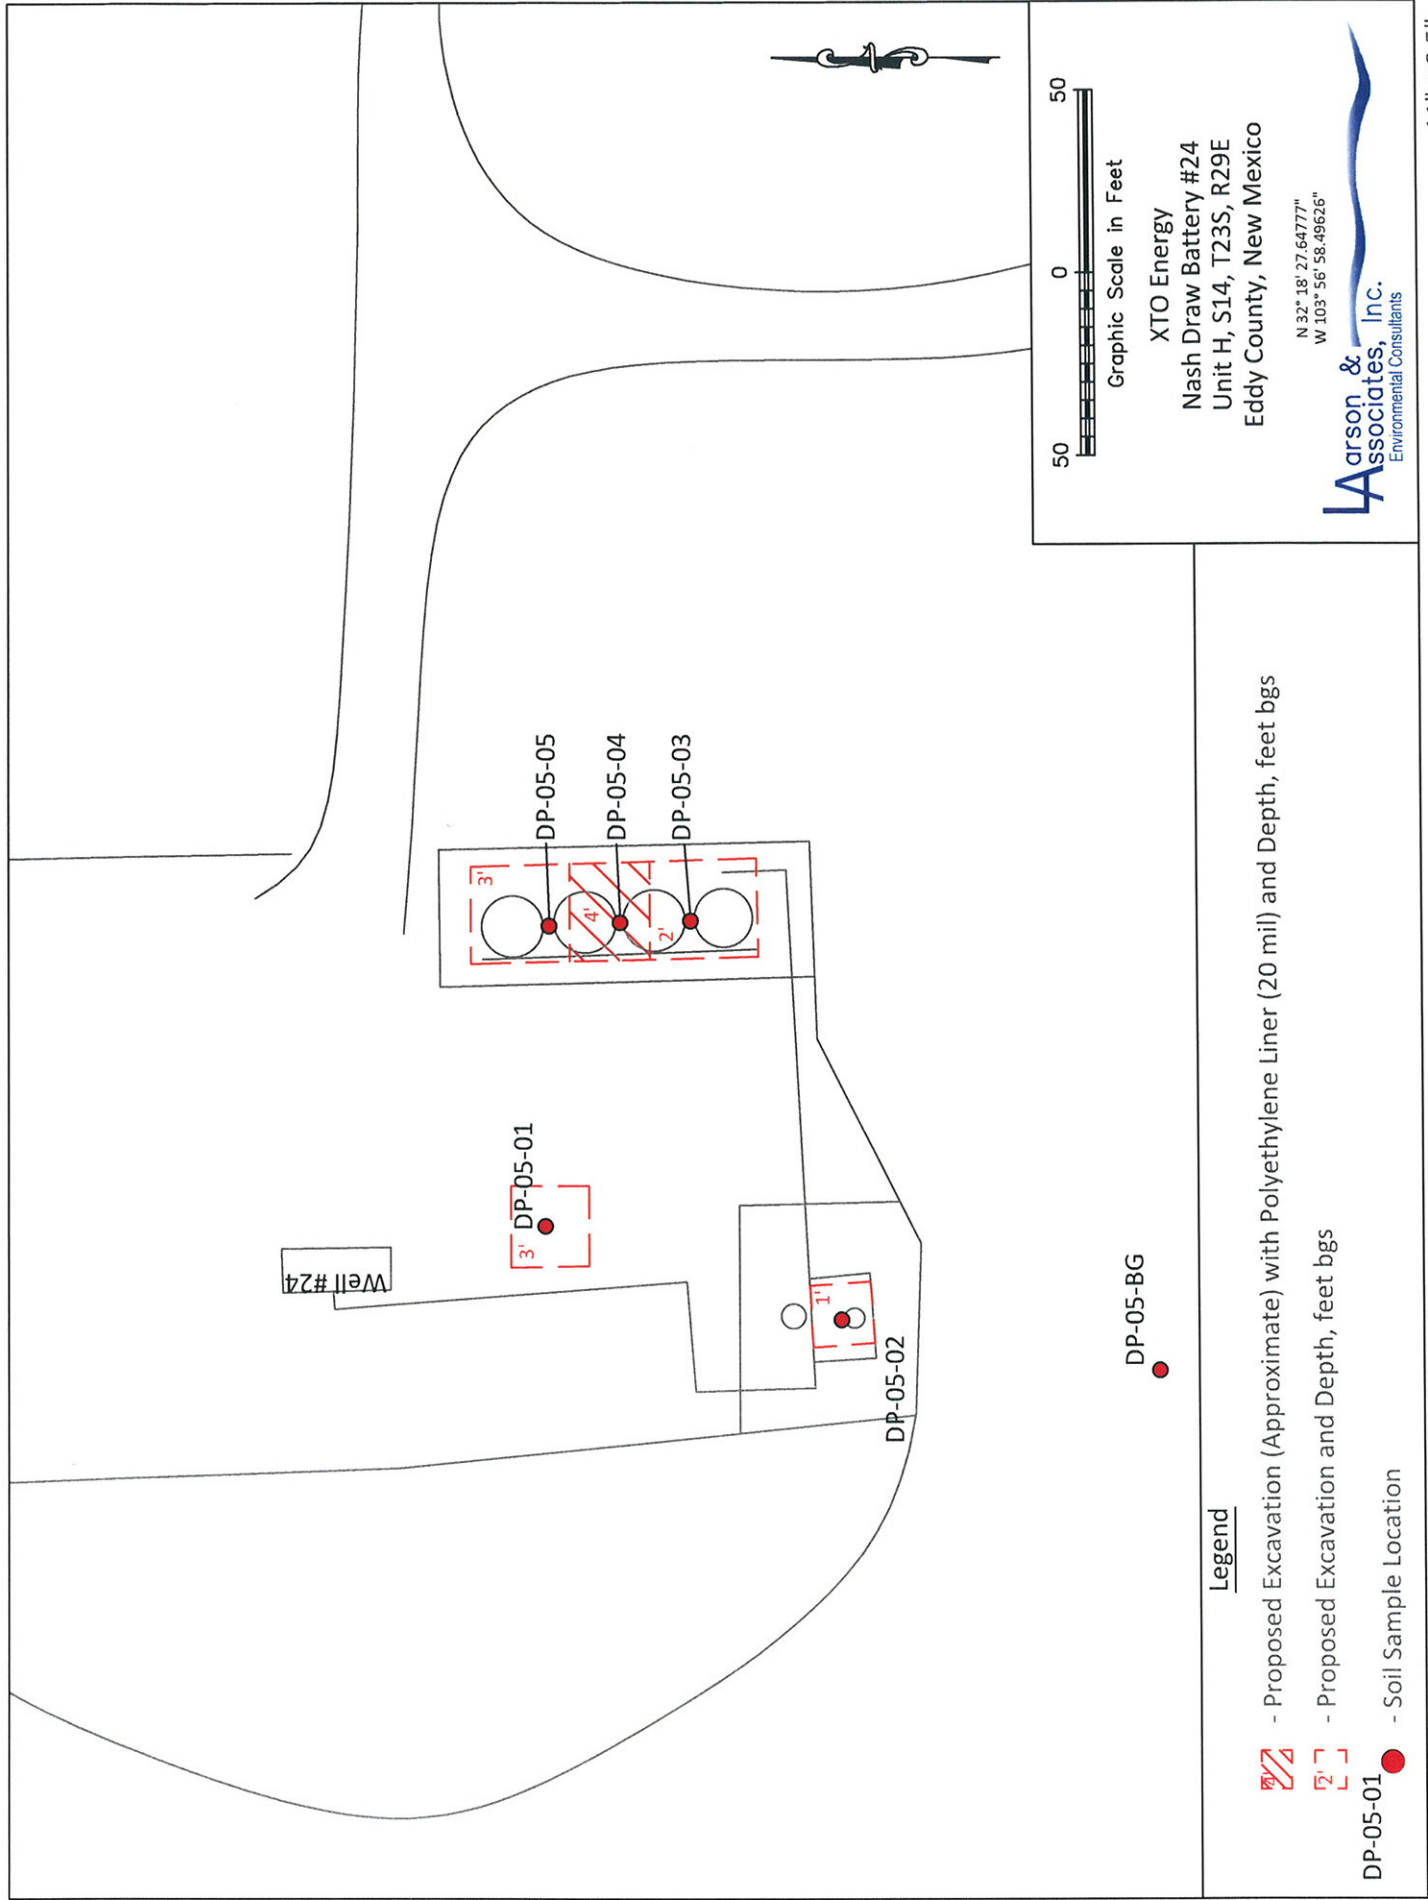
Site Map Showing Soil Sample Locations, Proposed Excavation Area and Depth
